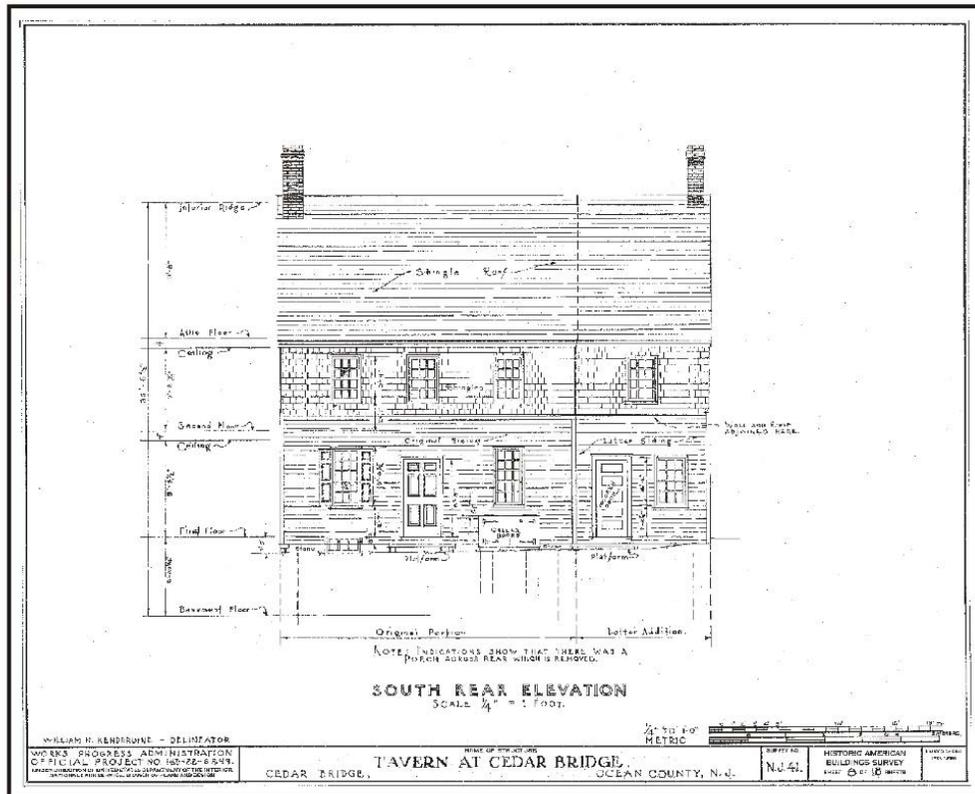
1938 HABS. South Rear Elevation of the Tavern at Cedar Bridge (Survey No. N.J. 41).
